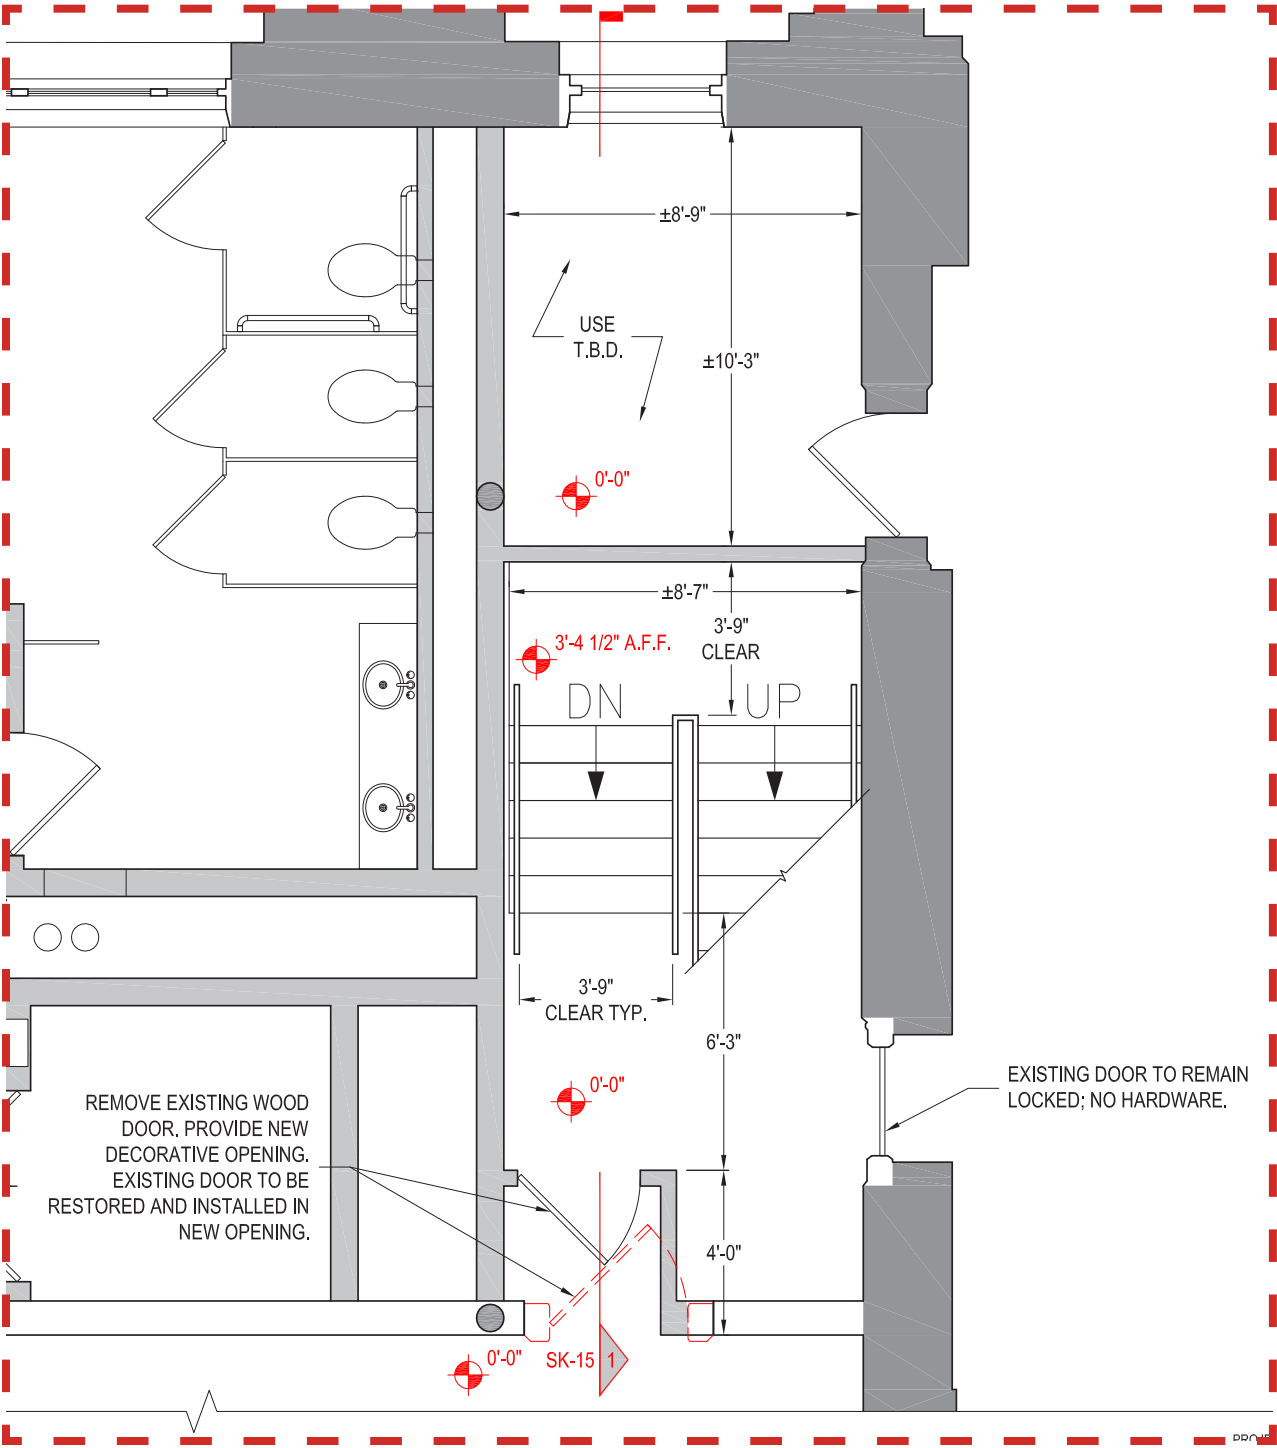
Proposed First Floor Northeast Egress Stair
